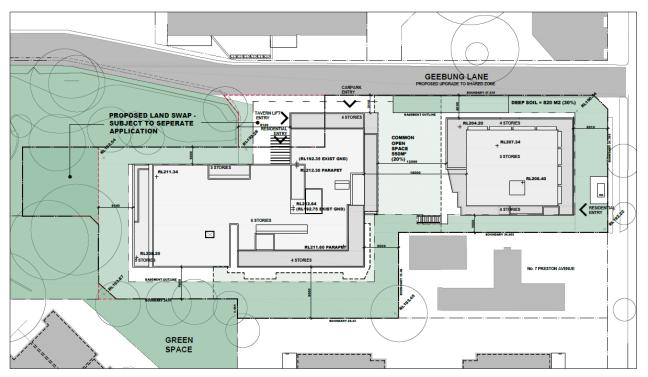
Site Plan of proposed residential flat building at 5 Preston Avenue undertaken once conditions of consent for DA19/0638 are completed.
